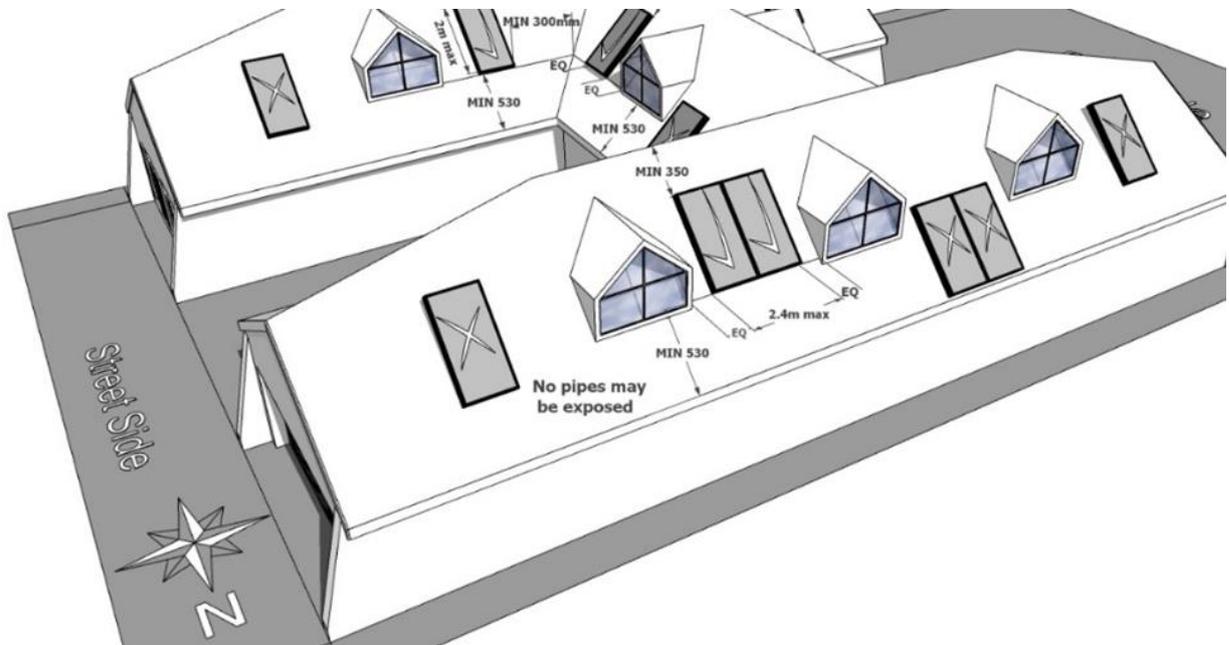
Acceptable positions for solar hot water heater panels on pitched roof planes (a cross indicates not desirable and tick desirable).
